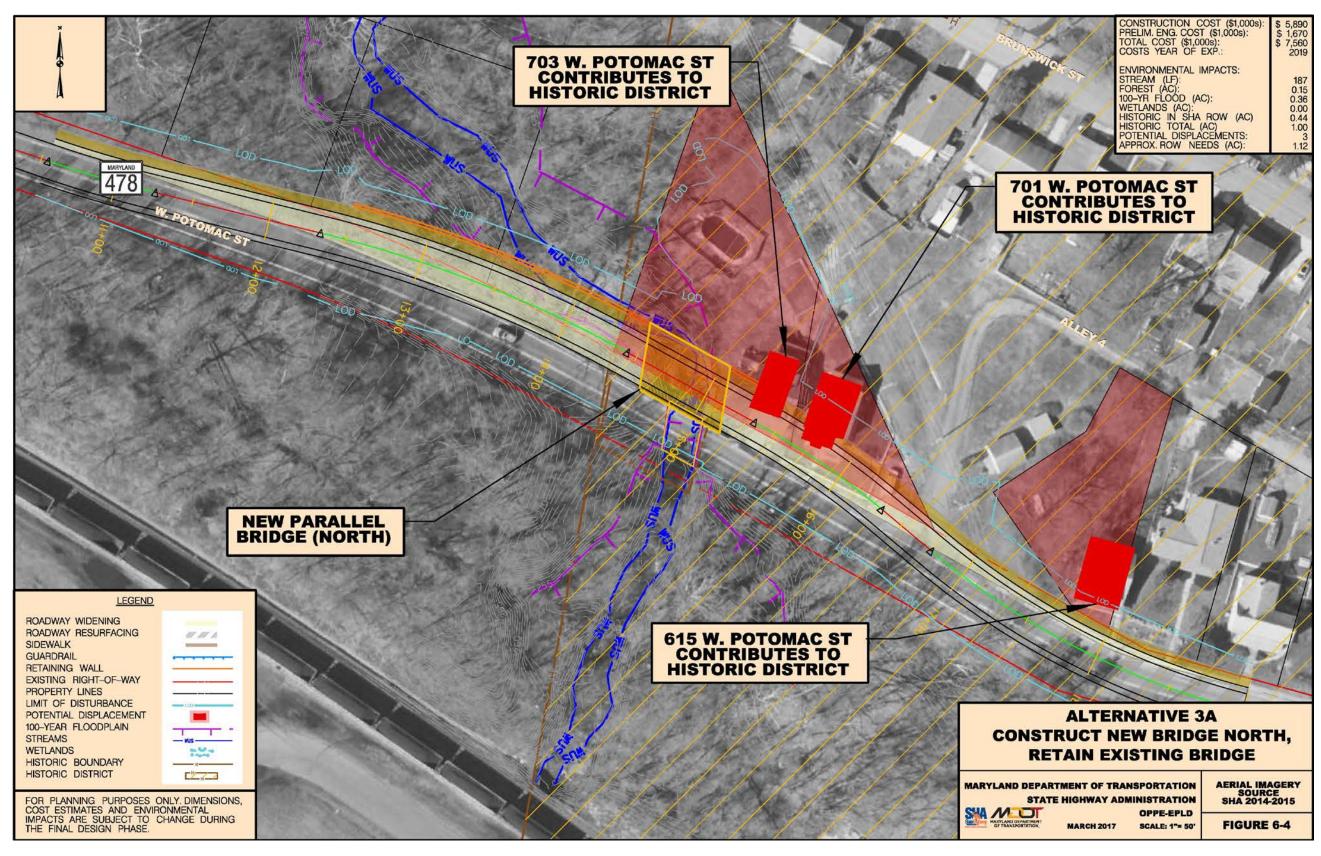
Alternative 3A: Construct New Bridge to the North, Retain Existing Bridge
